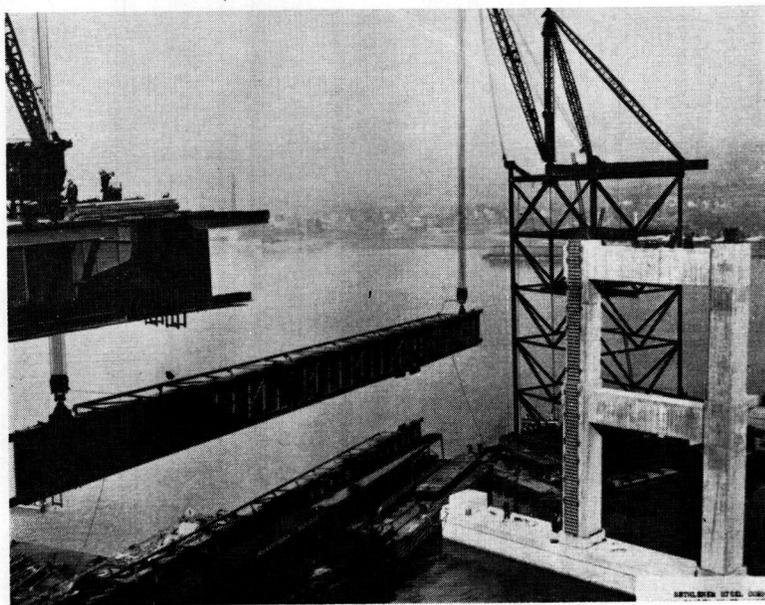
Upper flange of girder stiffened during erection with horizontal truss.
